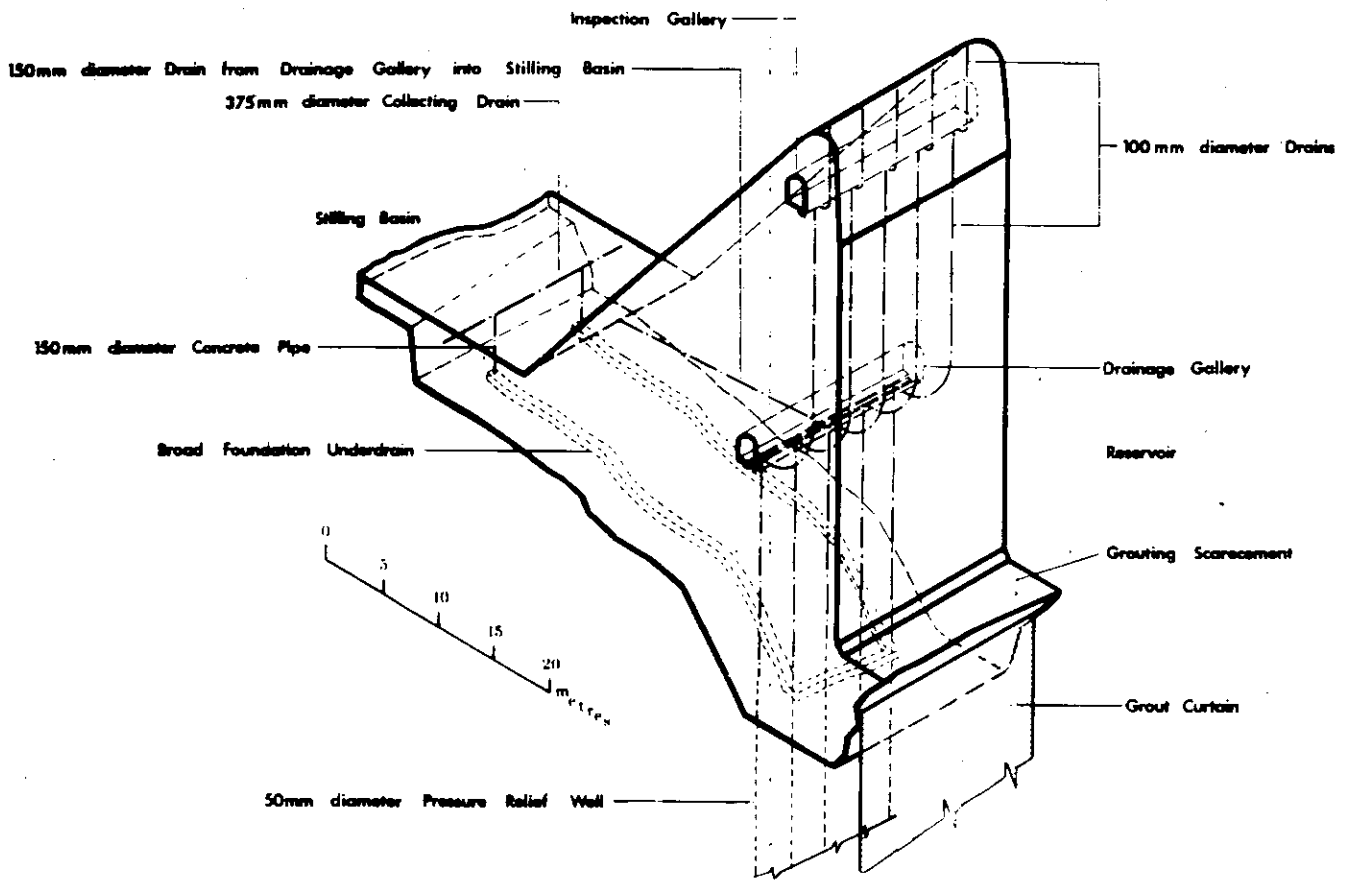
Drainage of Typical Overflow Monolith — Llysyfran Dam
